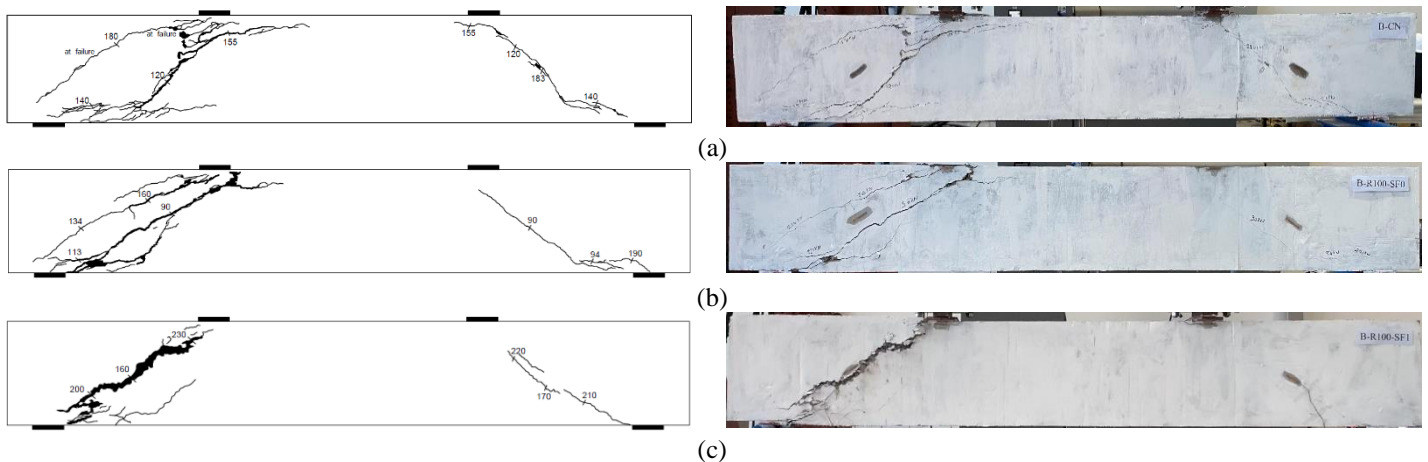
Crack pattern at failure; (a) BR0-SF0, (b) BR100-SF0, (c) BR100-SF1
